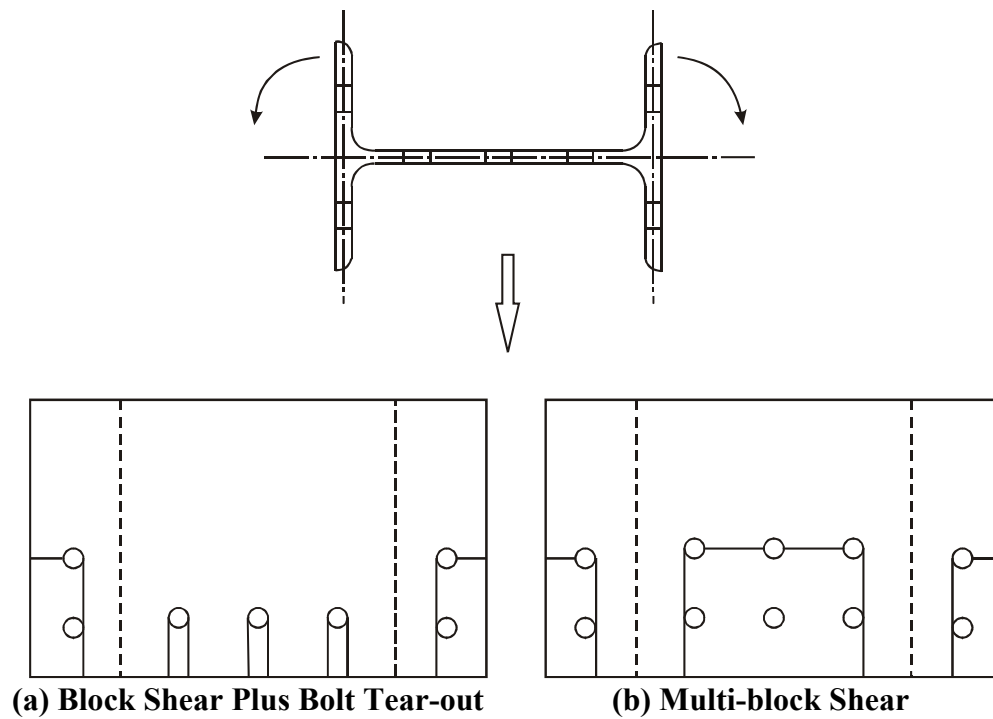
Combined Failures in Wide-Flange Shape
